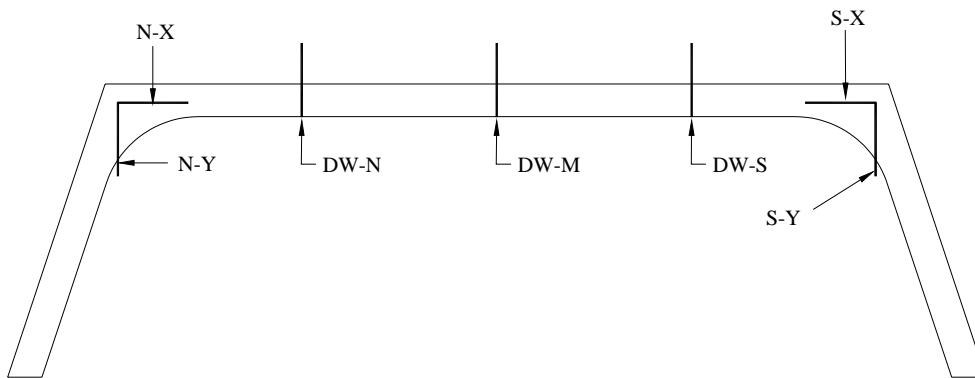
Locations of LVDTs and String Transducers (West Side)
